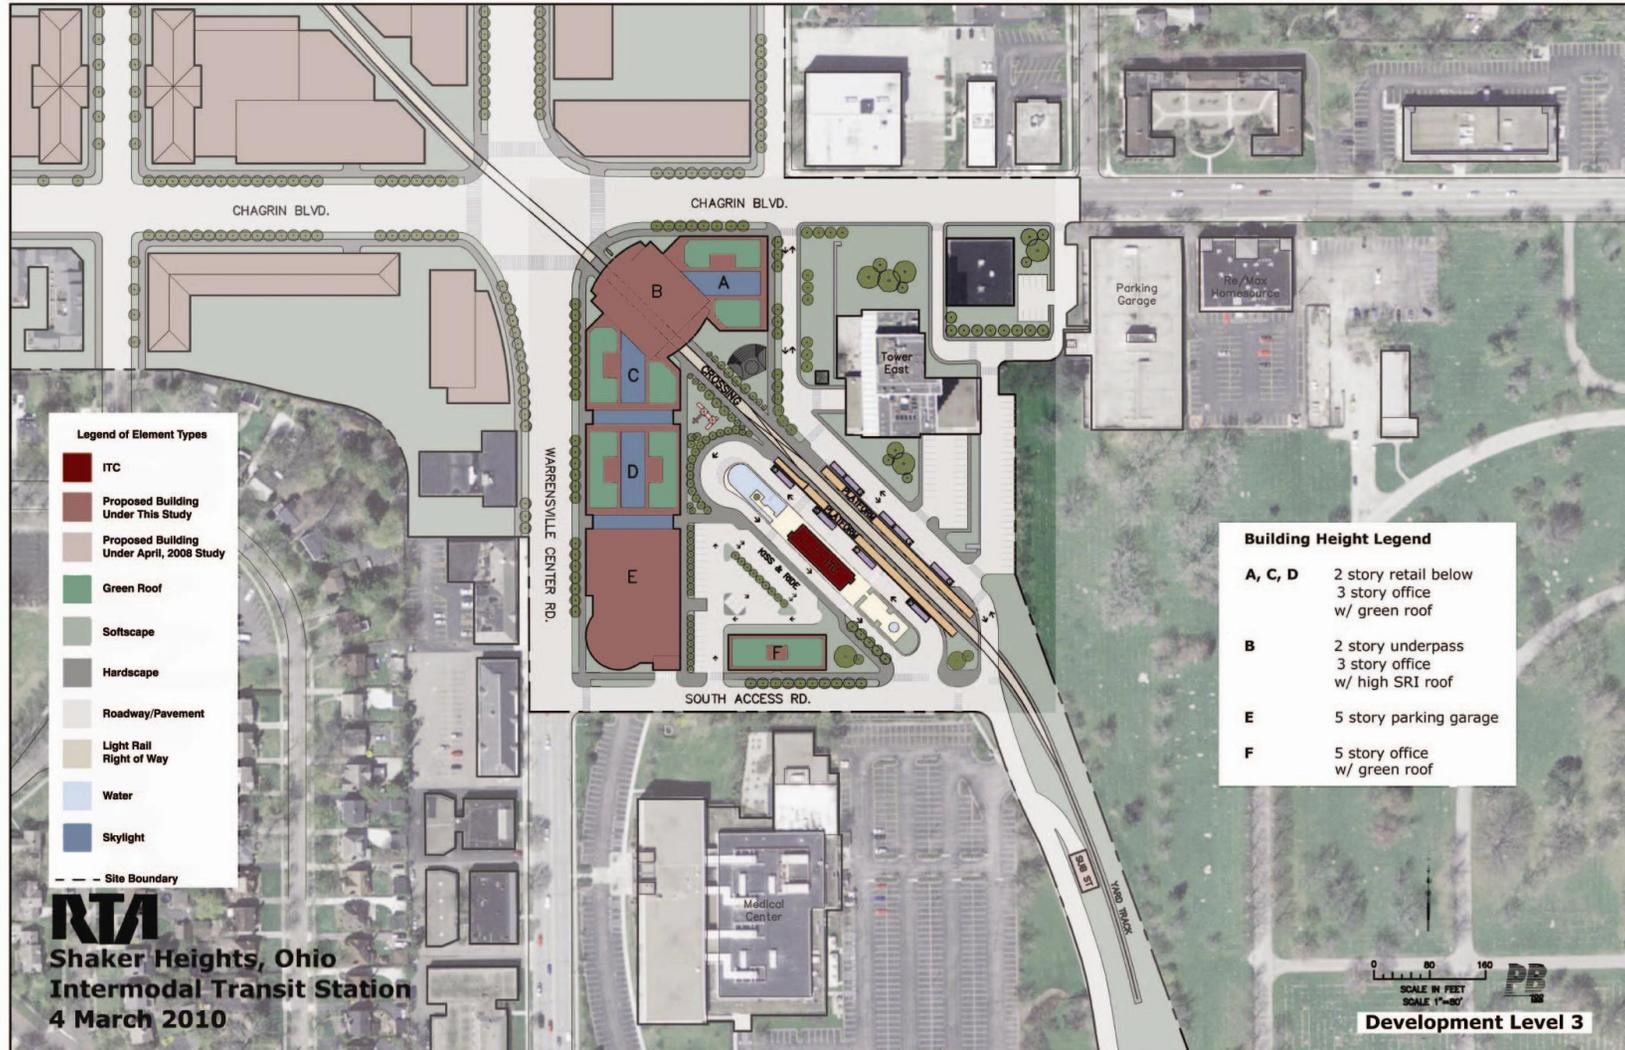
Development Level 3 Proposed Site Plan Concept
